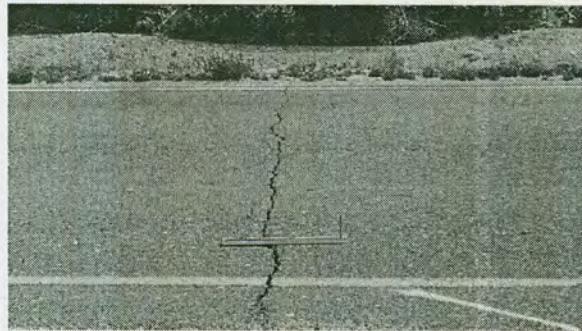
Thermal Cracking of Asphalt Paved Road (Fwa, 2006)
